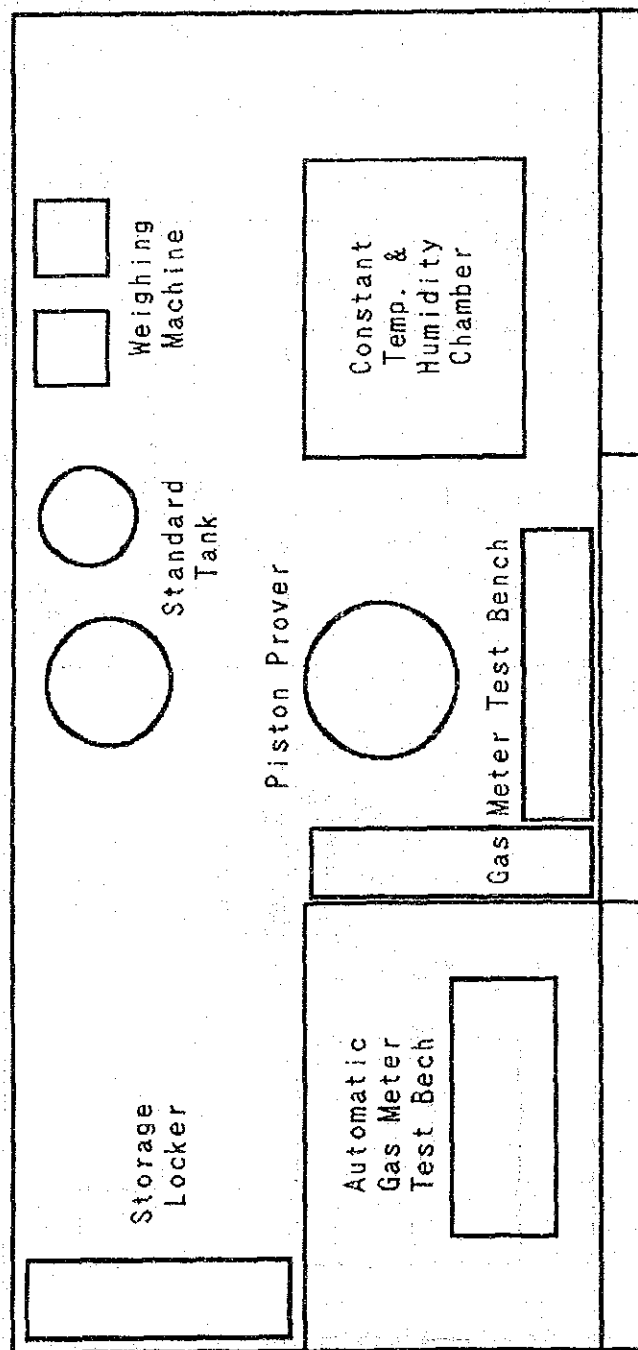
Layout Plan of Force and Pressure Calibration Laboratory
